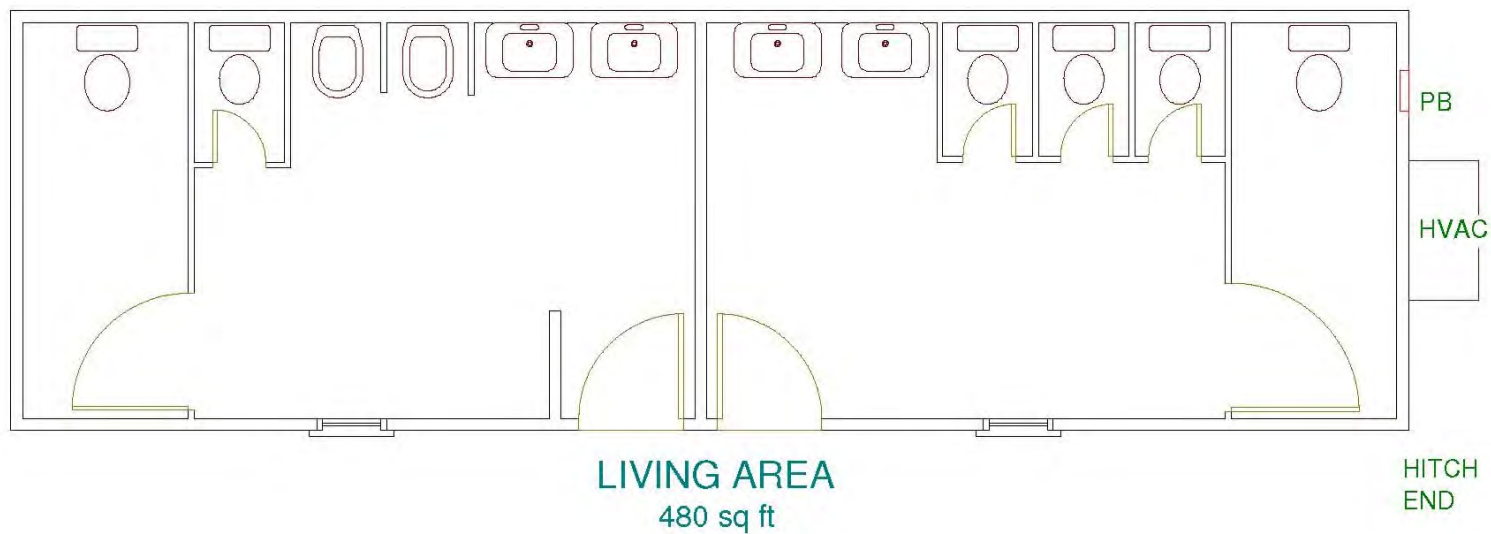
EXHIBIT E – RENTAL TRAILER RESTROOM FLOORPLAN
